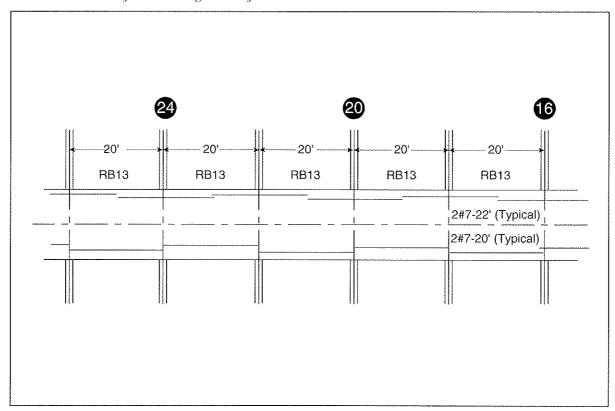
Schematic of distorted section showing reinforcing bar arrangement for roof girder at Column Line G.
